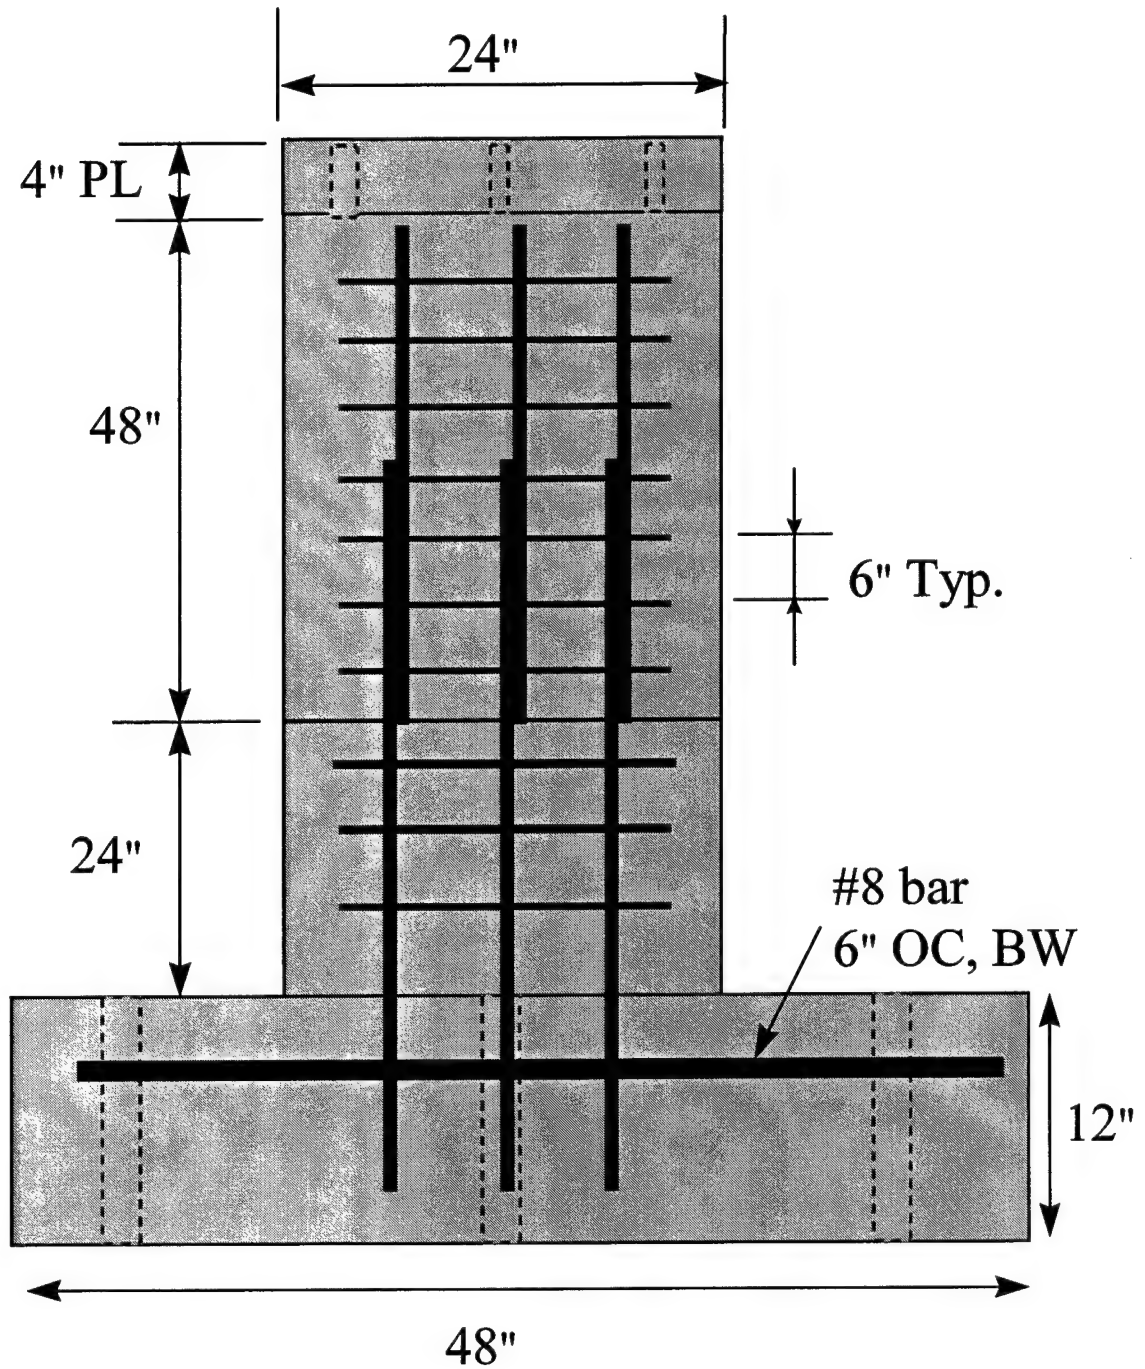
Side view of overall dimensions and rebar layout typical for all models
